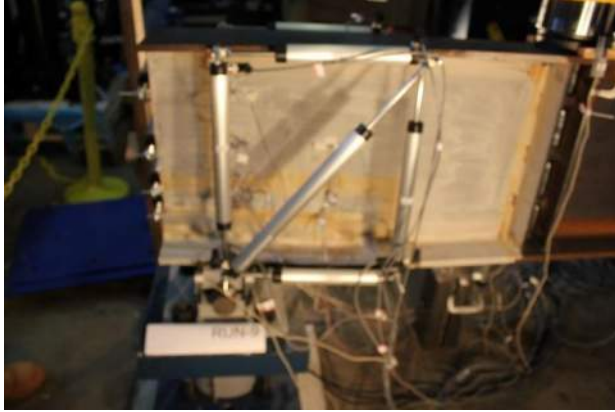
Damaged Girder Right: +0.75 in
